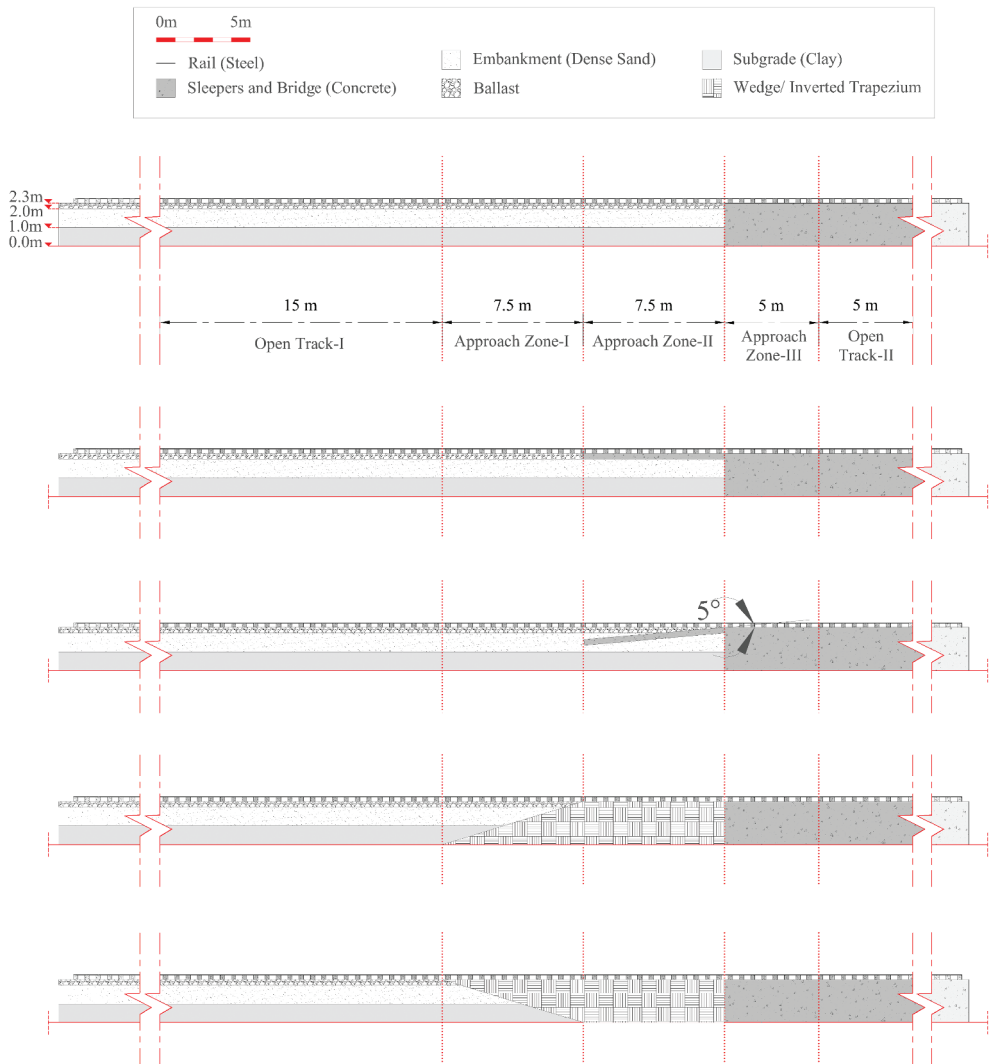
Cross-sectional details of the embankment-bridge transition under study with standard design, horizontal approach slab, inclined approach slab, transition wedge and the new design (in this order from top to bottom).
